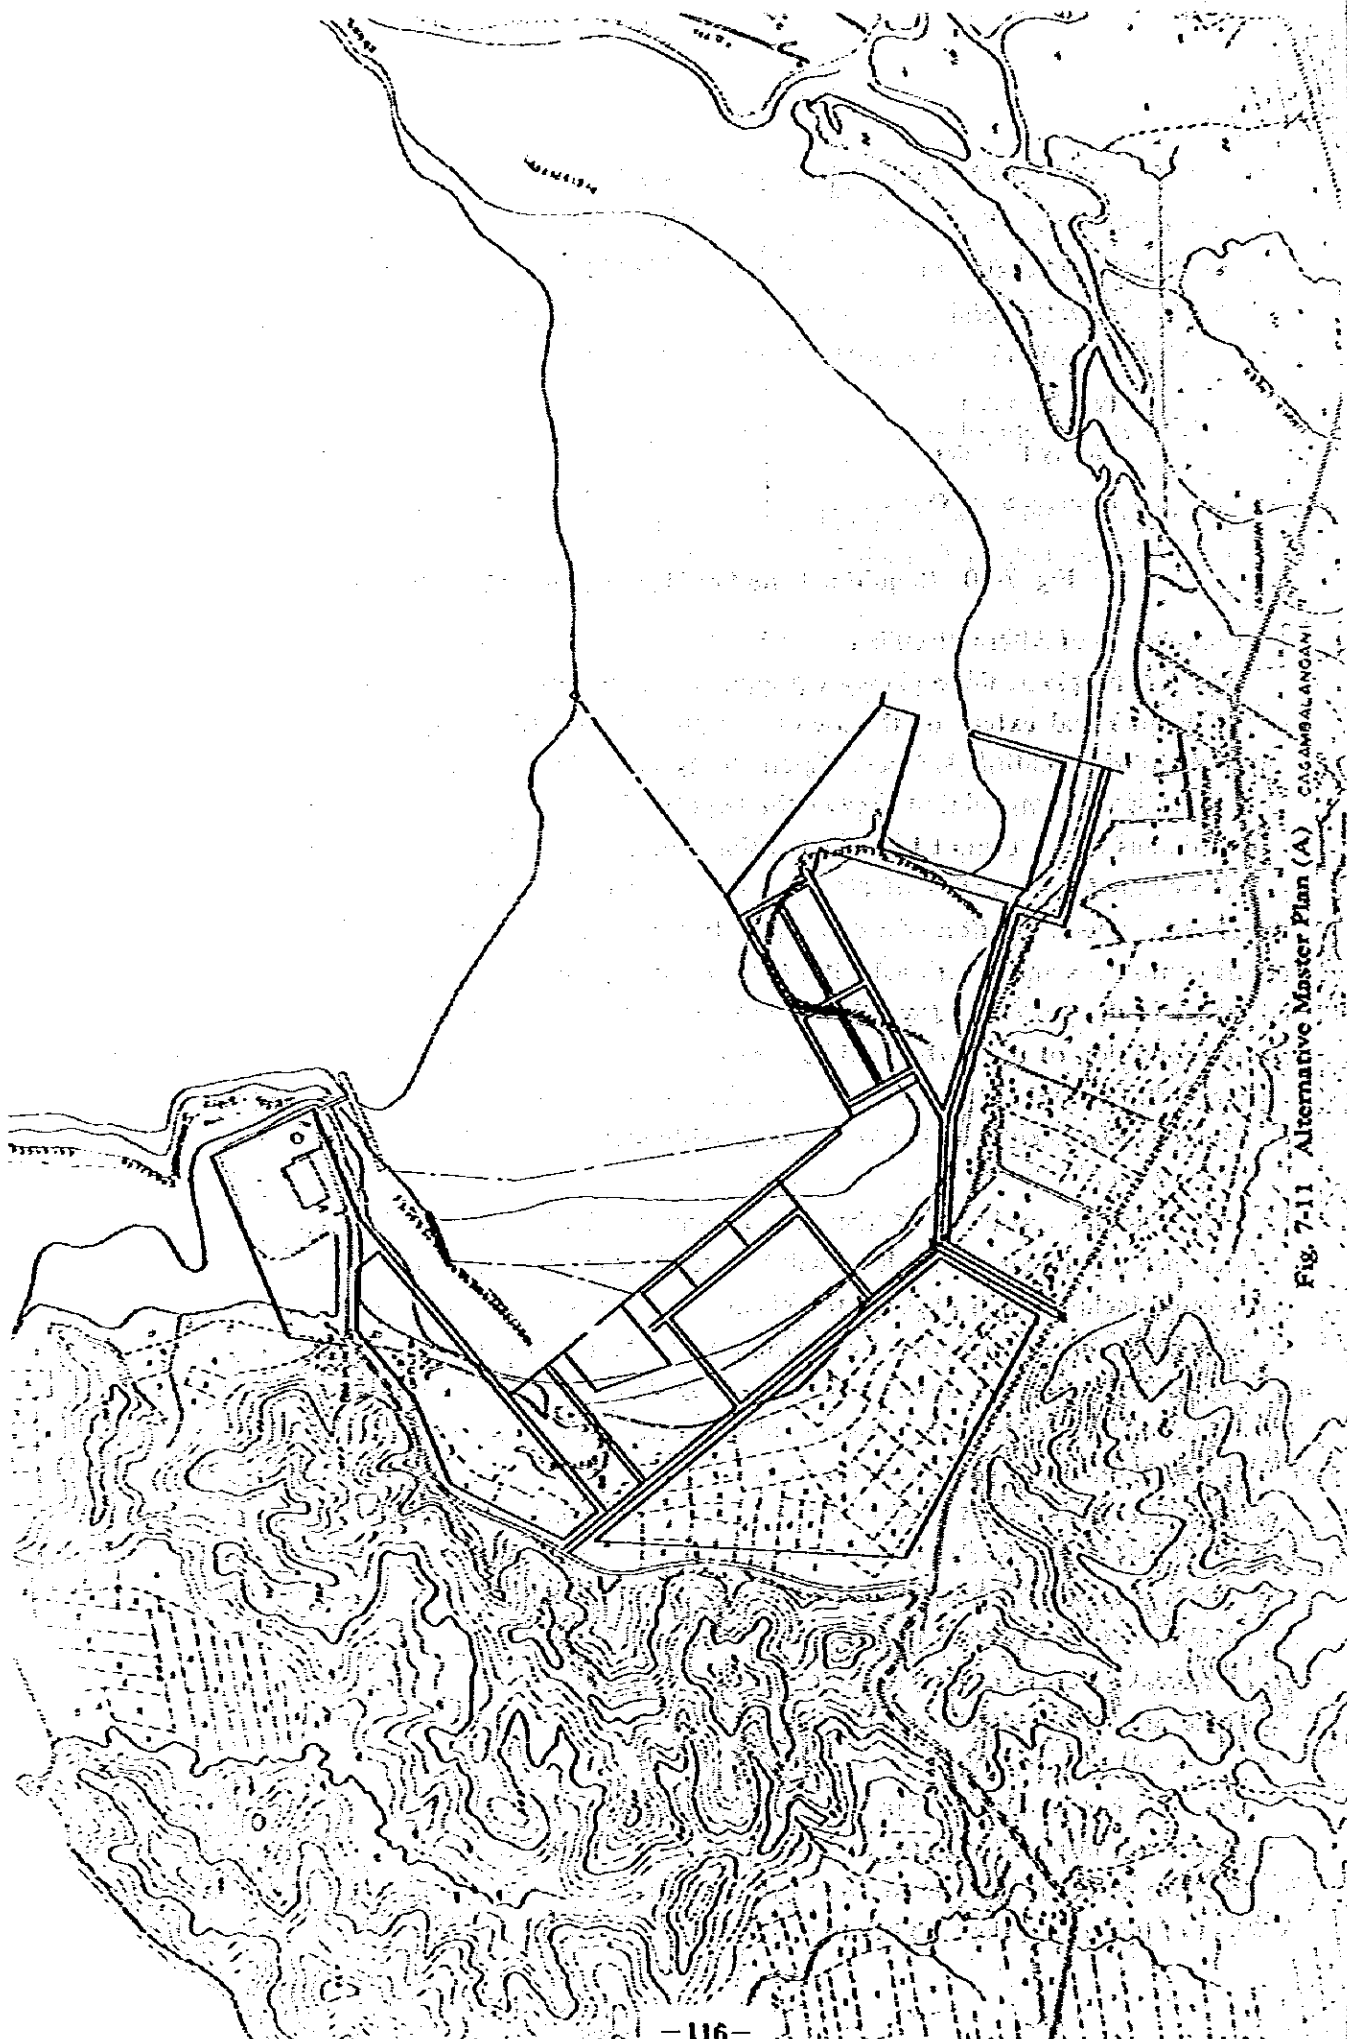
Alternative Master Plan (A) CAGAMBAL ANCONANI
